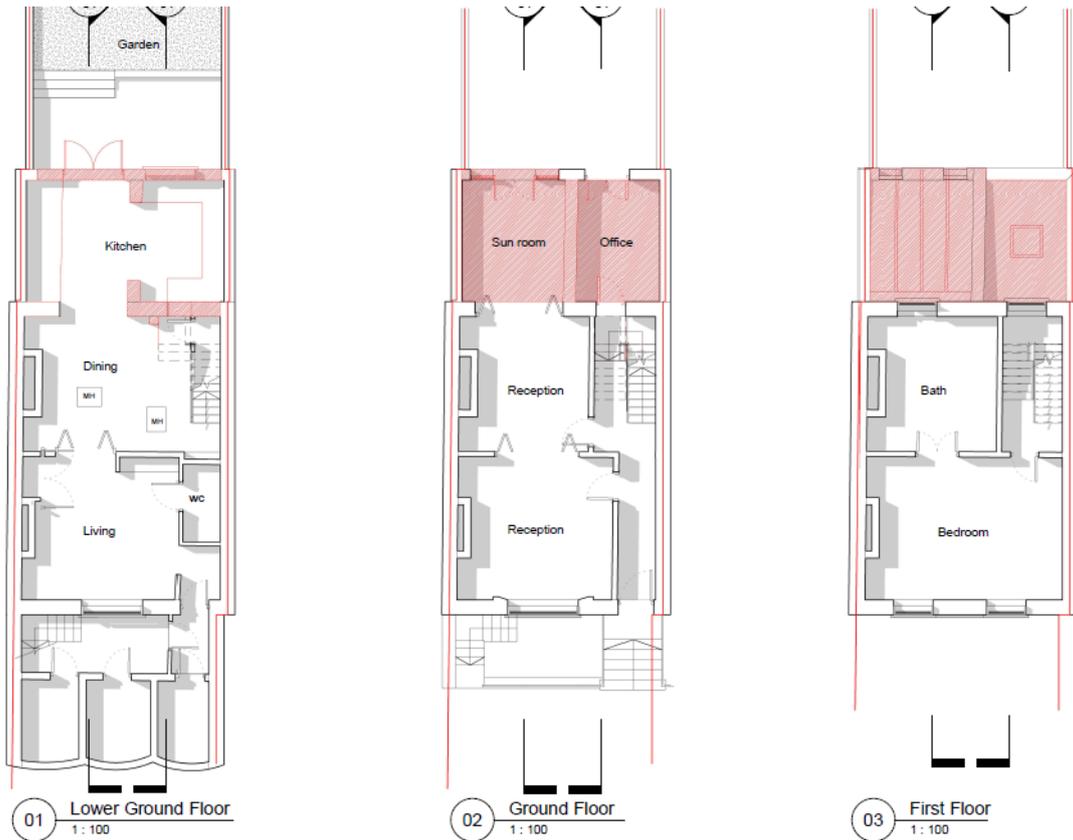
Existing floor plans (red highlight indicating structure to be demolished).
